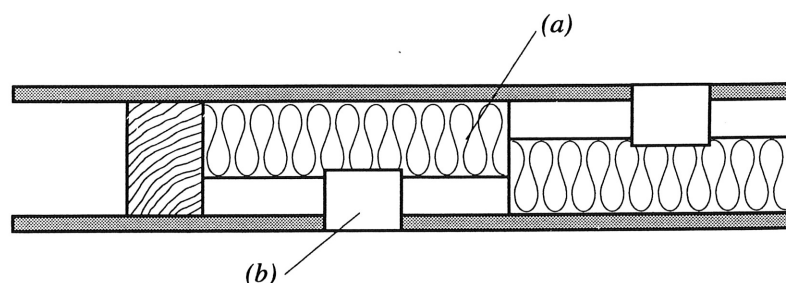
Socket protected by insulating layer. (a) Insulating layer, (b) socket.
